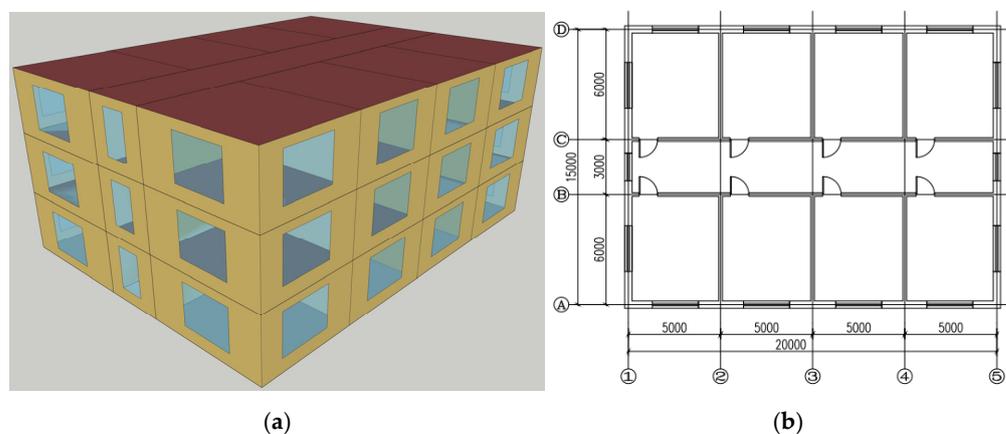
Model drawings and floor plans of typical office buildings. (a) SketchUp model diagram; (b) CAD plan of the building.
